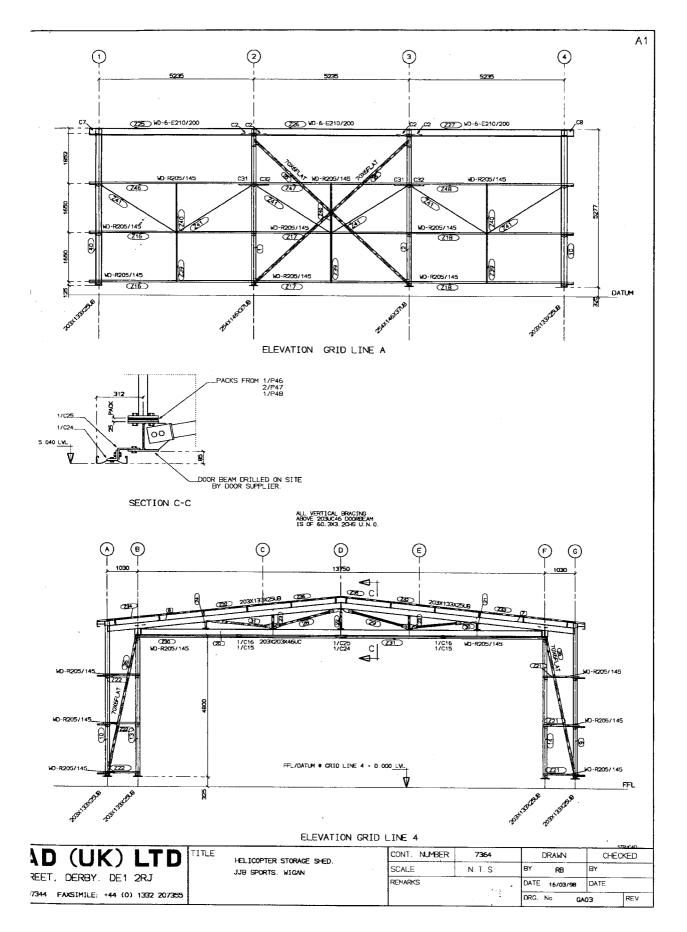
Typical helicopter storage shed made with trussed frame in steel (Strucad, Derby, UK)
